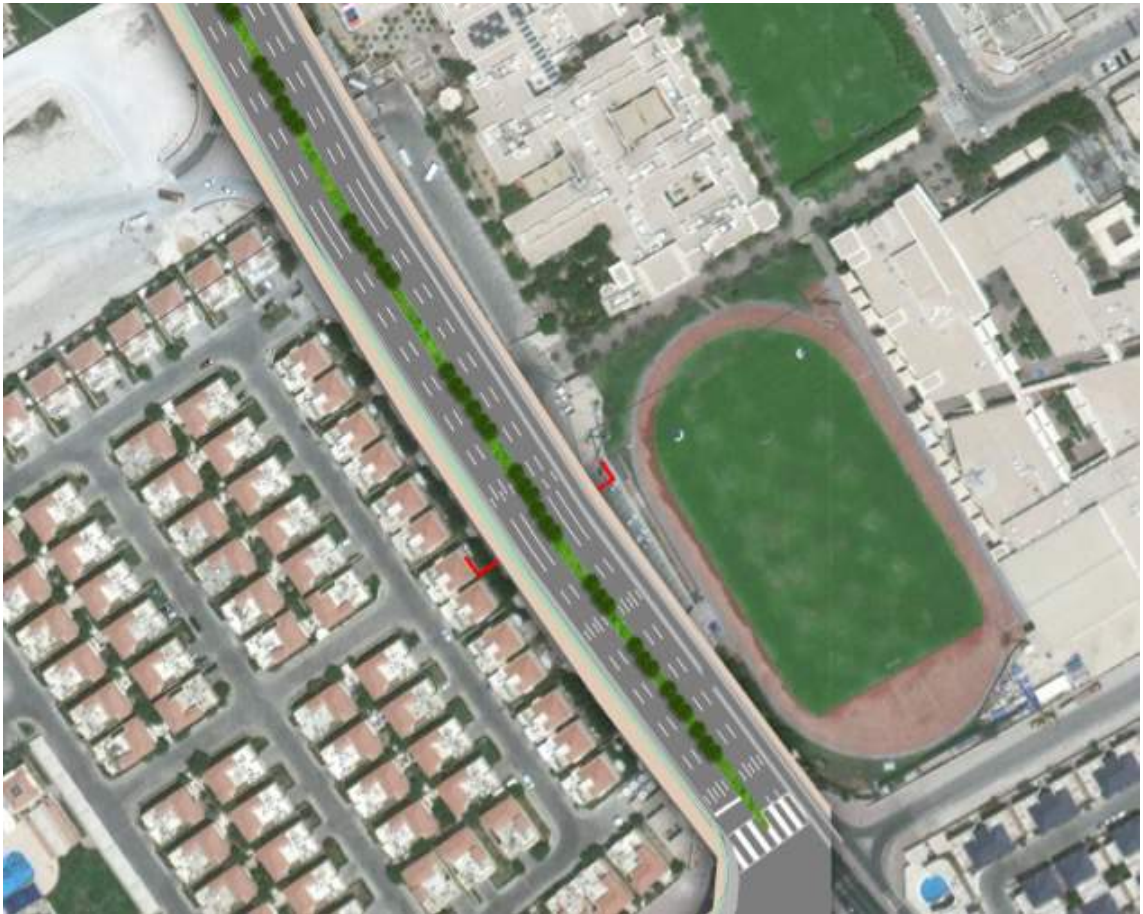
Enhanced Cross-section of Al Bustan Street (Author)
